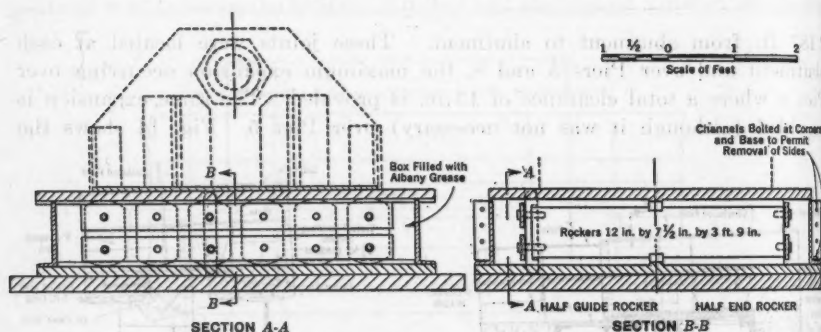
LAKE CHAMPLAIN BRIDGE, ROCKER NEST AT PIER 7.
